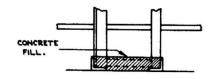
PARTS OF M.D.F. STRUCTURE TO BE MASKED WHEN PAINTING.
